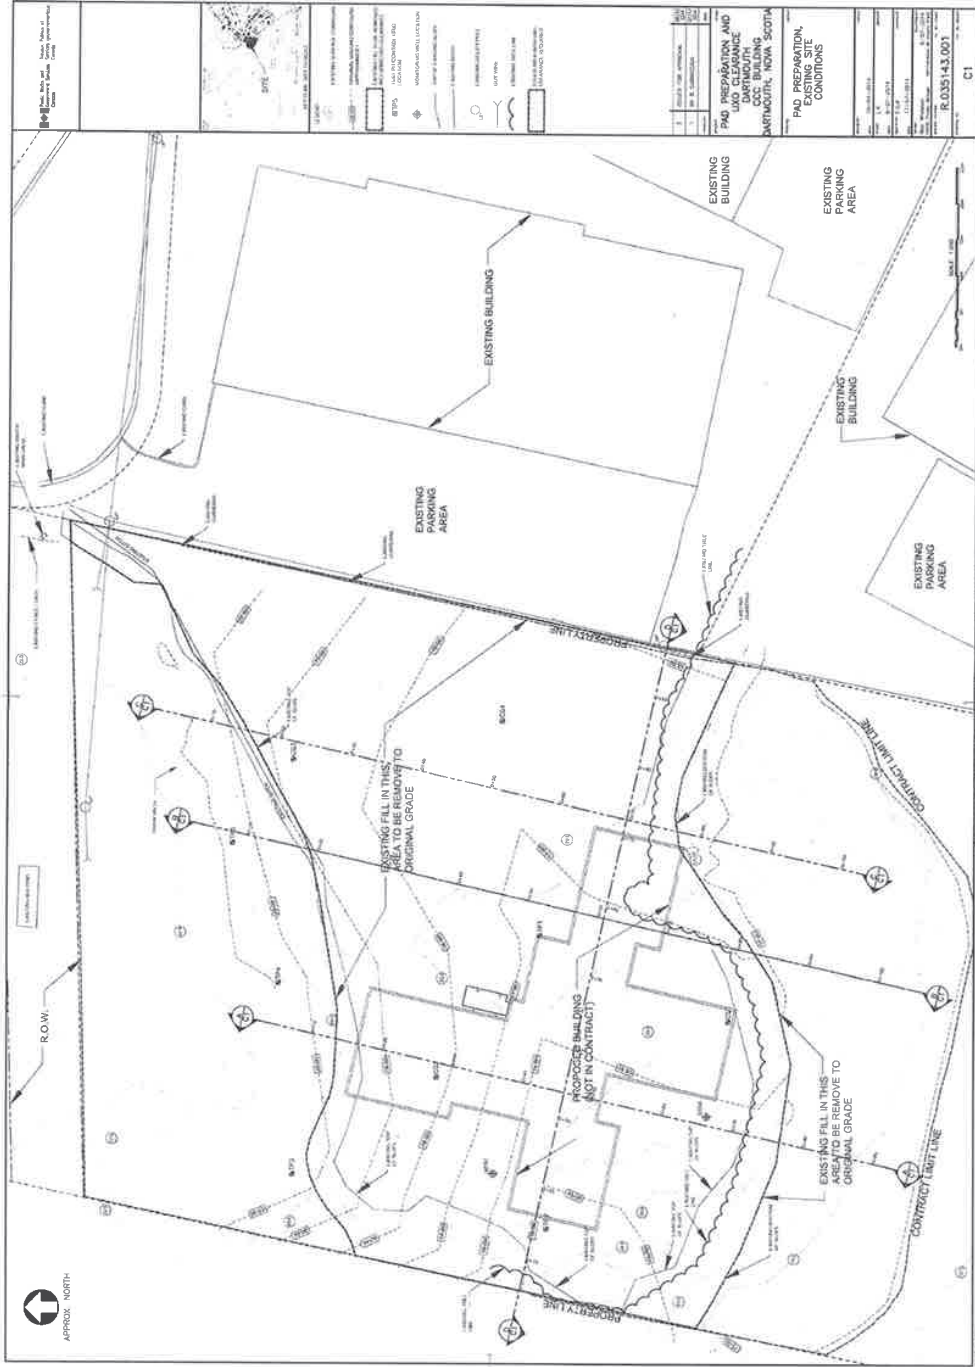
Plan showing area to be excavated, Burnside Industrial Park, Dartmouth, NS.
